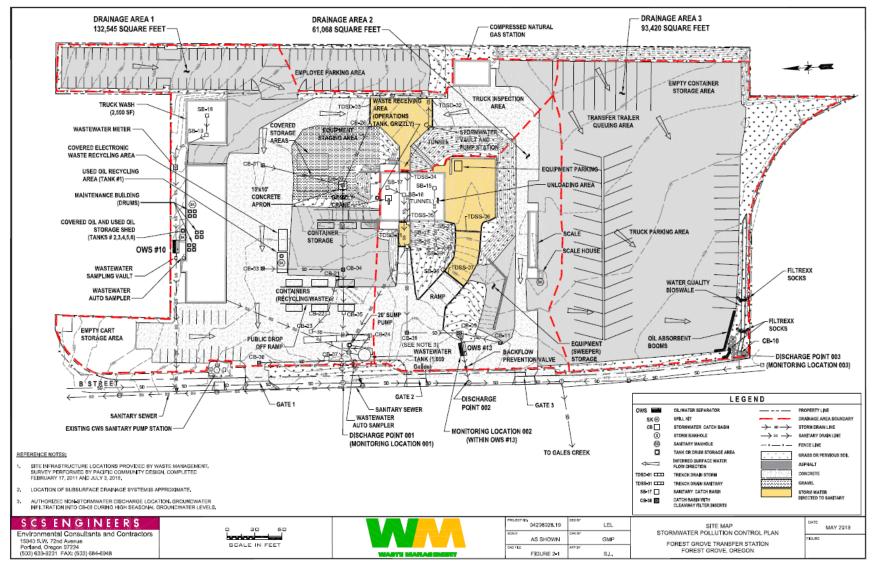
Stormwater and Wastewater Site Plan (May 2019 update)
